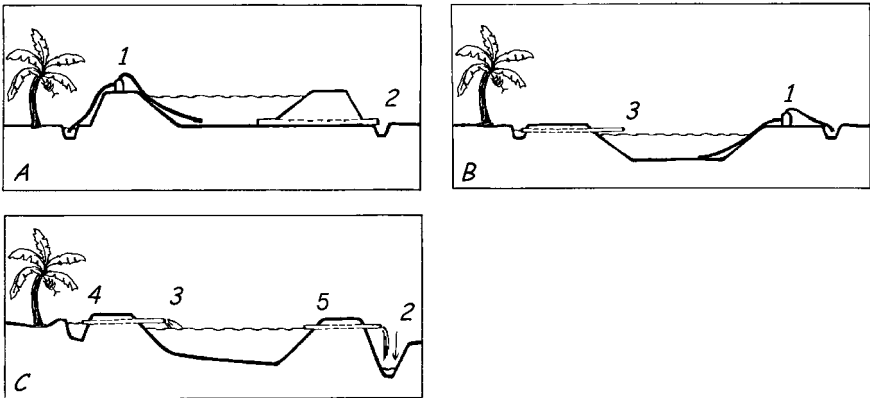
Different types of diversion ponds (Viveen et al., 1985) A: embankment pond B: excavated pond; C: contour pond. 1. Pump, 2. Drainage canal, 3. Inlet pipe, 4. Diversion canal, 5. Overflow pipe
